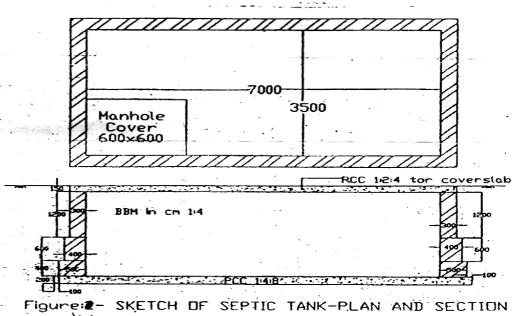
SKETCH OF SEPTIC TANK-PLAN AND SECTION
